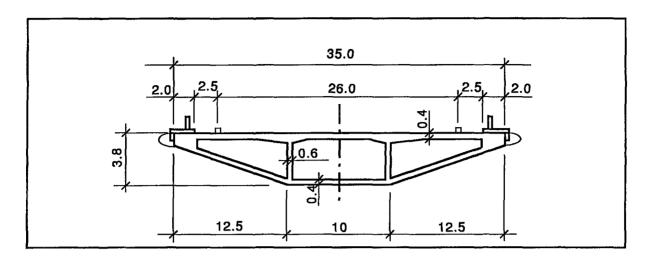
CROSS SECTION OF THE ACCESS SPAN DECK (In meters)
